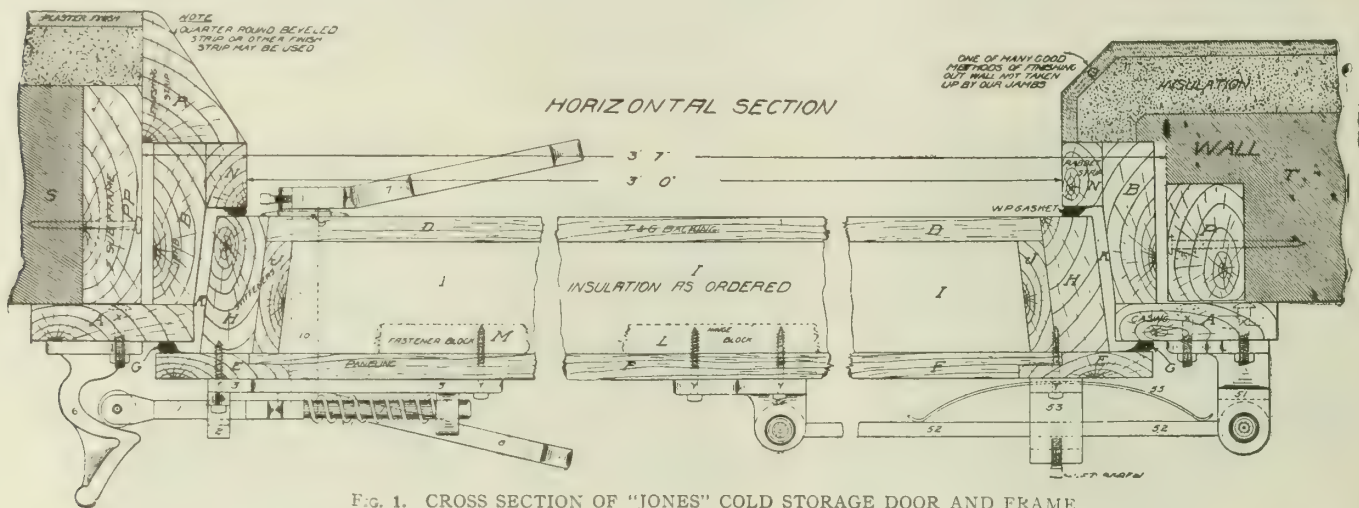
CROSS SECTION OF "JONES" COLD STORAGE DOOR AND FRAME
